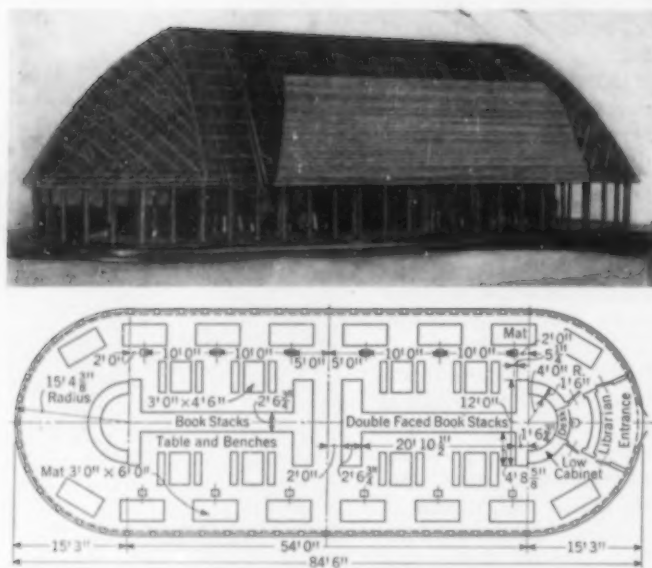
GENERAL FLOOR PLAN OF THE LIBRARY AND, ABOVE, THE SCALE MODEL OF THE COMPLETE STRUCTURE
